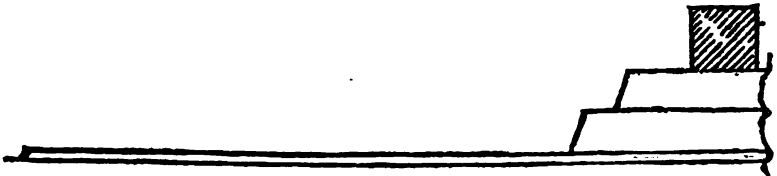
SECTION OF PYRAMIDAL ELEVATION OF GOVERNOR'S HOUSE AT UXMAL. SIDE VIEW.
